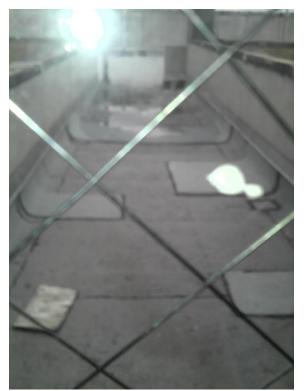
of 6 inadequacies Date: 11-30-2011 Roof patching
